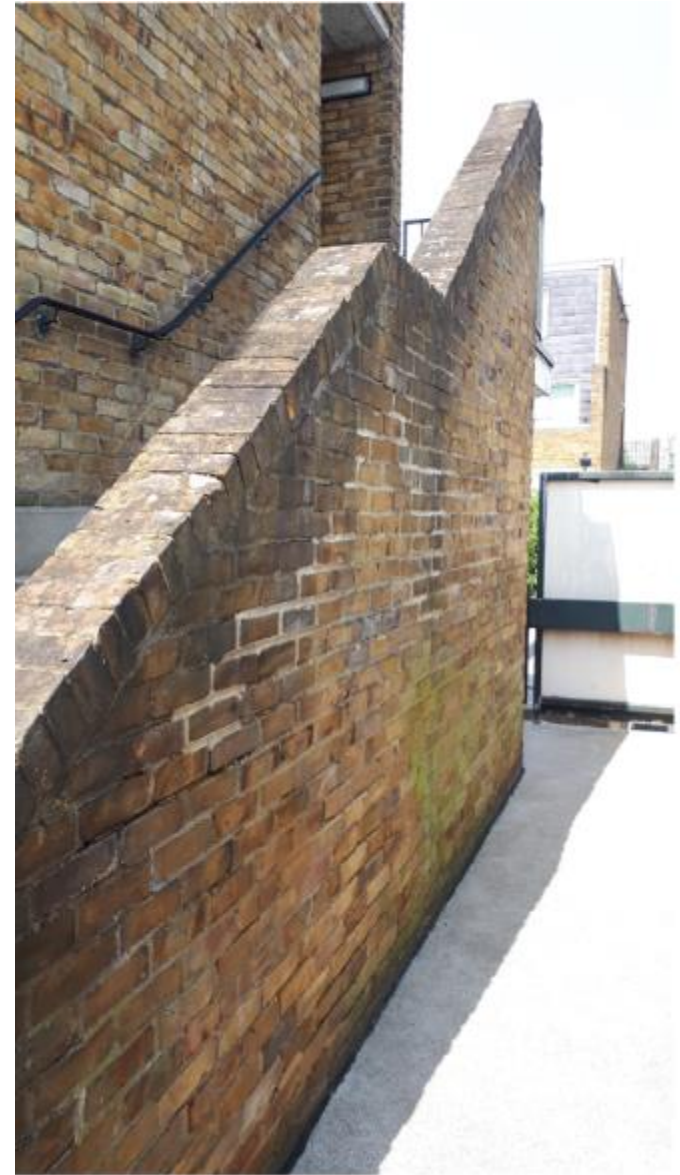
As on other Blocks, localised patch repointing of brickwork required, although efforts have previously been made.
